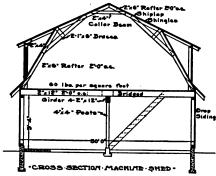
Cross-section of the shed shown in Fig. 162.
